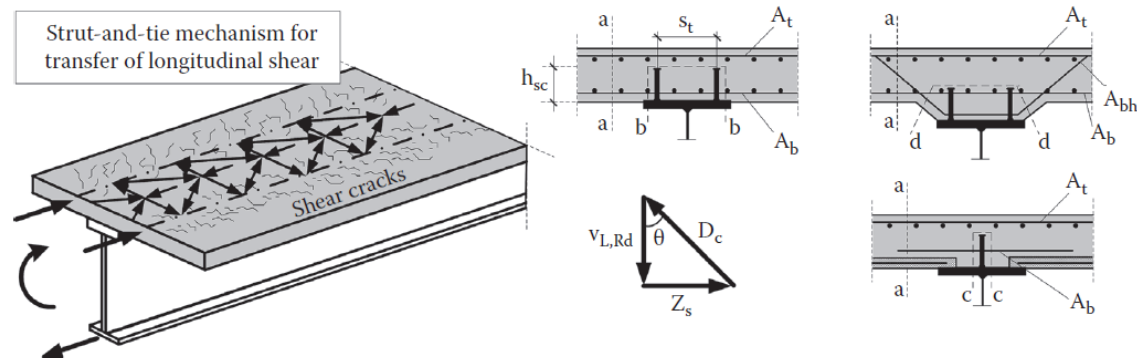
Failure mechanism and typical sections for checking shear failure (Vayas & Iliopoulos, 2013)
